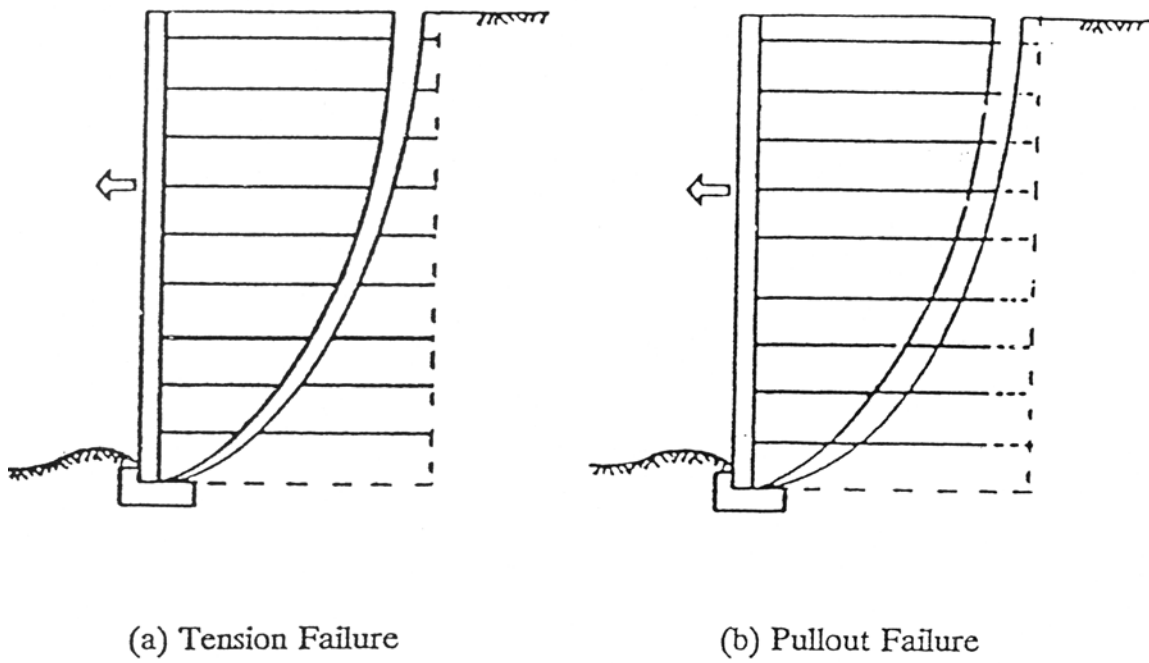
Internal stability mechanisms of failure in reinforced soil walls (after Christopher et al., 1989).
